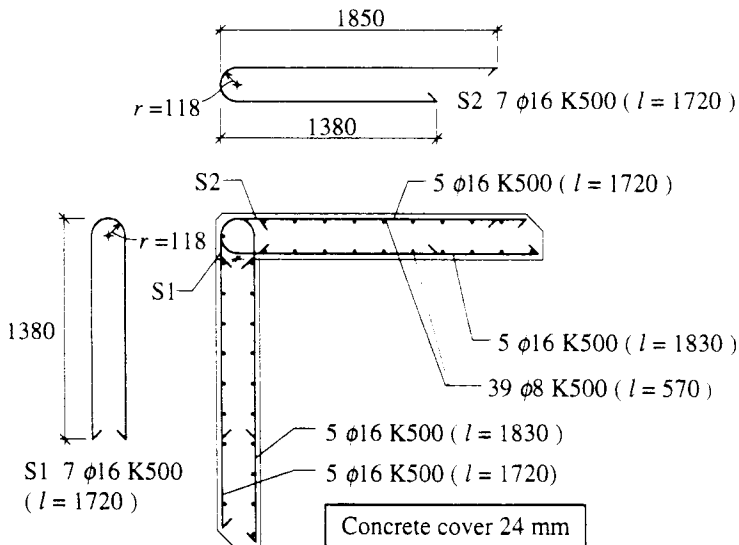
Reinforcement bars used in specimens RV5 and RV6.
